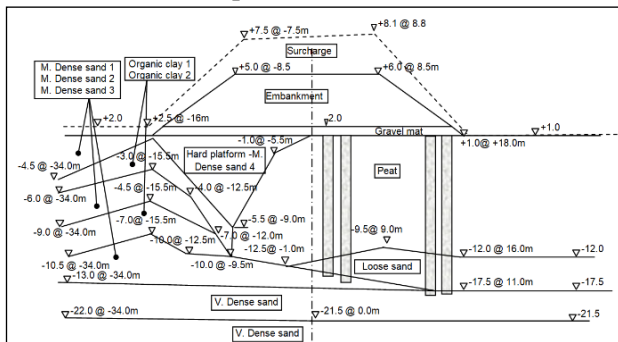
Cross section of the GCPs supported embankment- section FK0+560m
